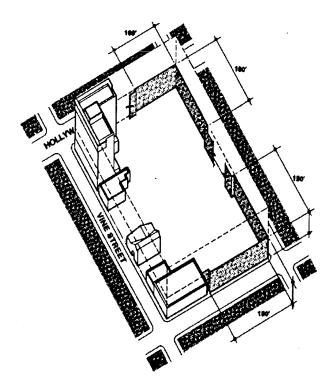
Street facades shall express modulation, such as varied wall planes, at least once every 100 feet along the Boulevard and once every 150 feet along other streets in the Boulevard Mixed use and Commercial Mixed Use land use areas.
